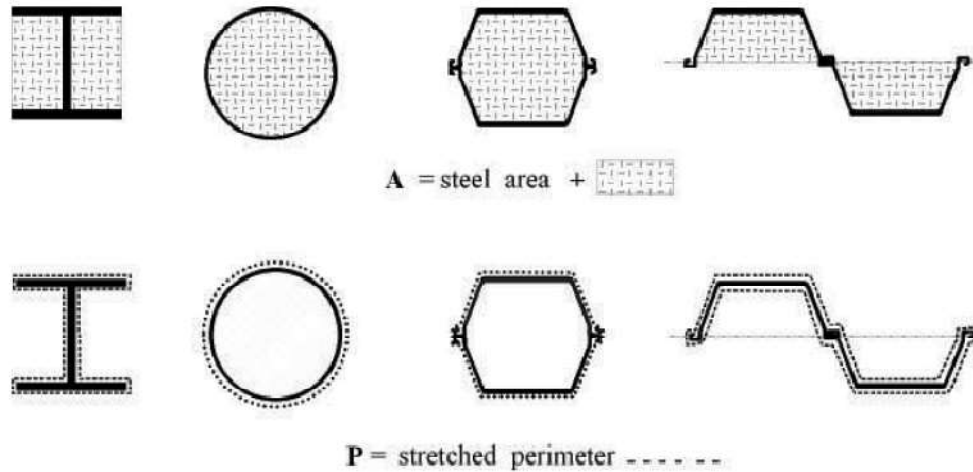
Area A and perimeter P to be used for open-end steel piles & sheet piles
